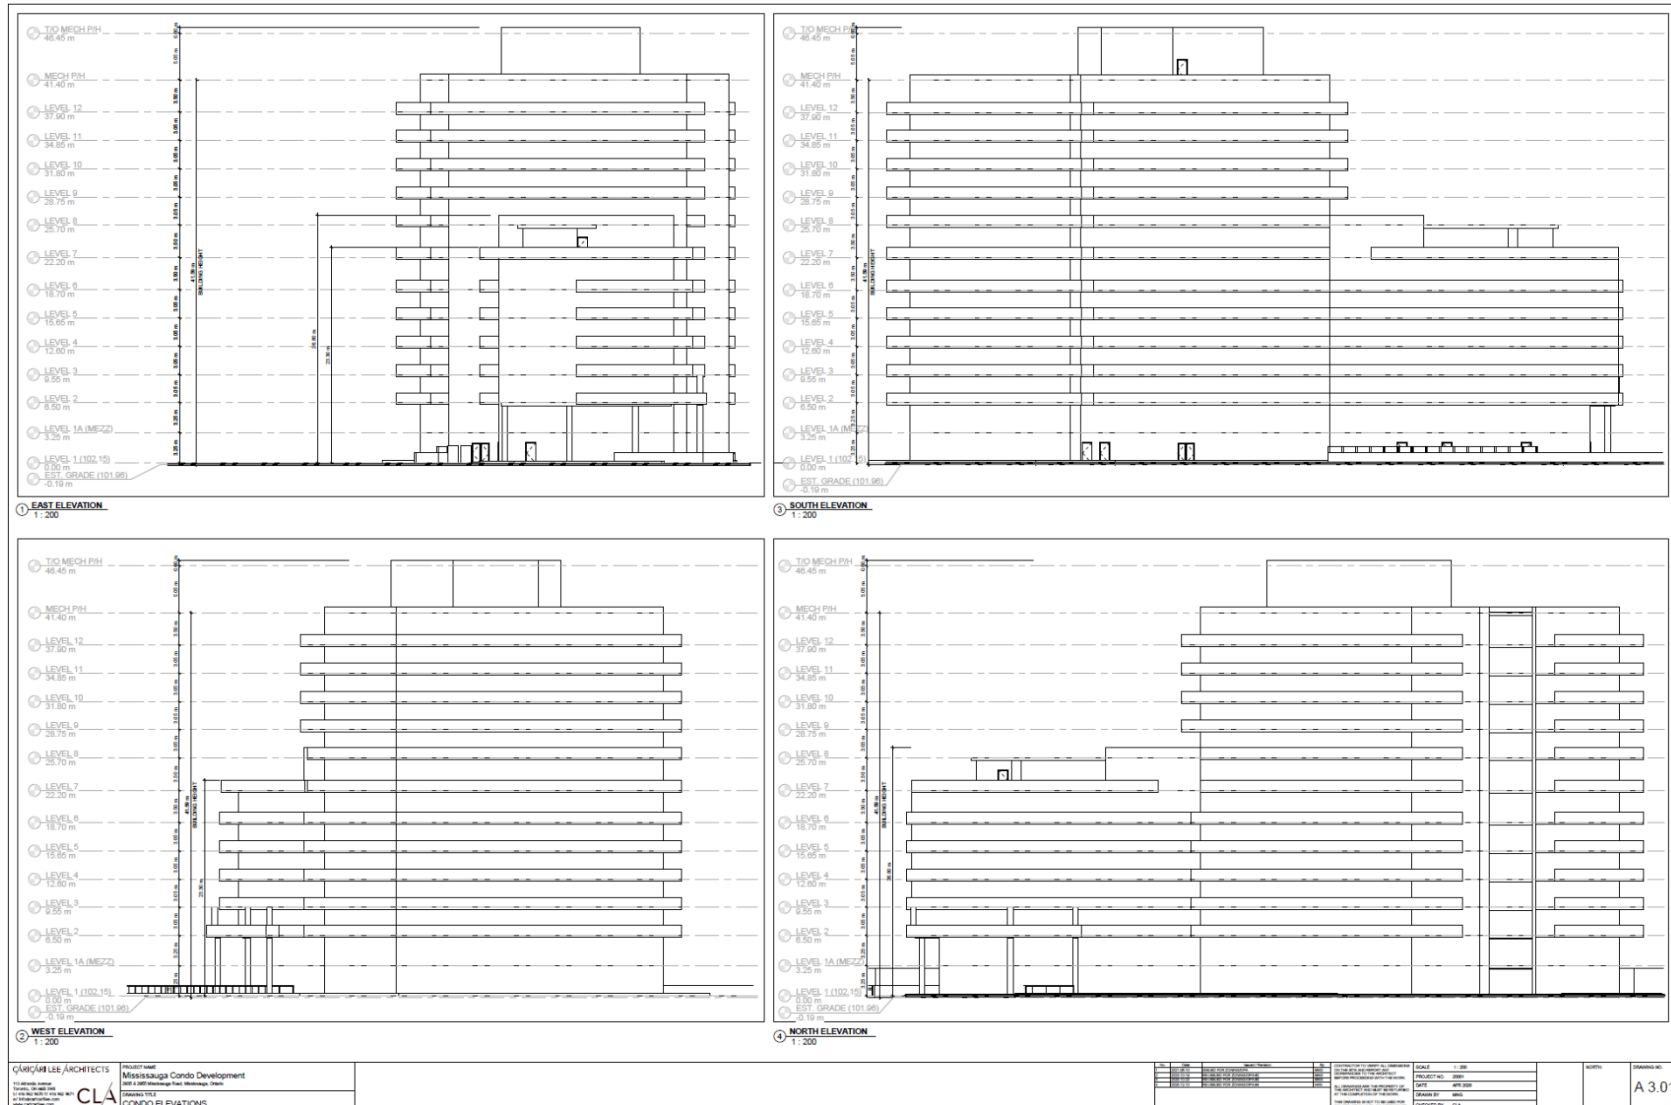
Elevations of the proposed 12-storey tower (Caricari Lee Architects, 2026)
